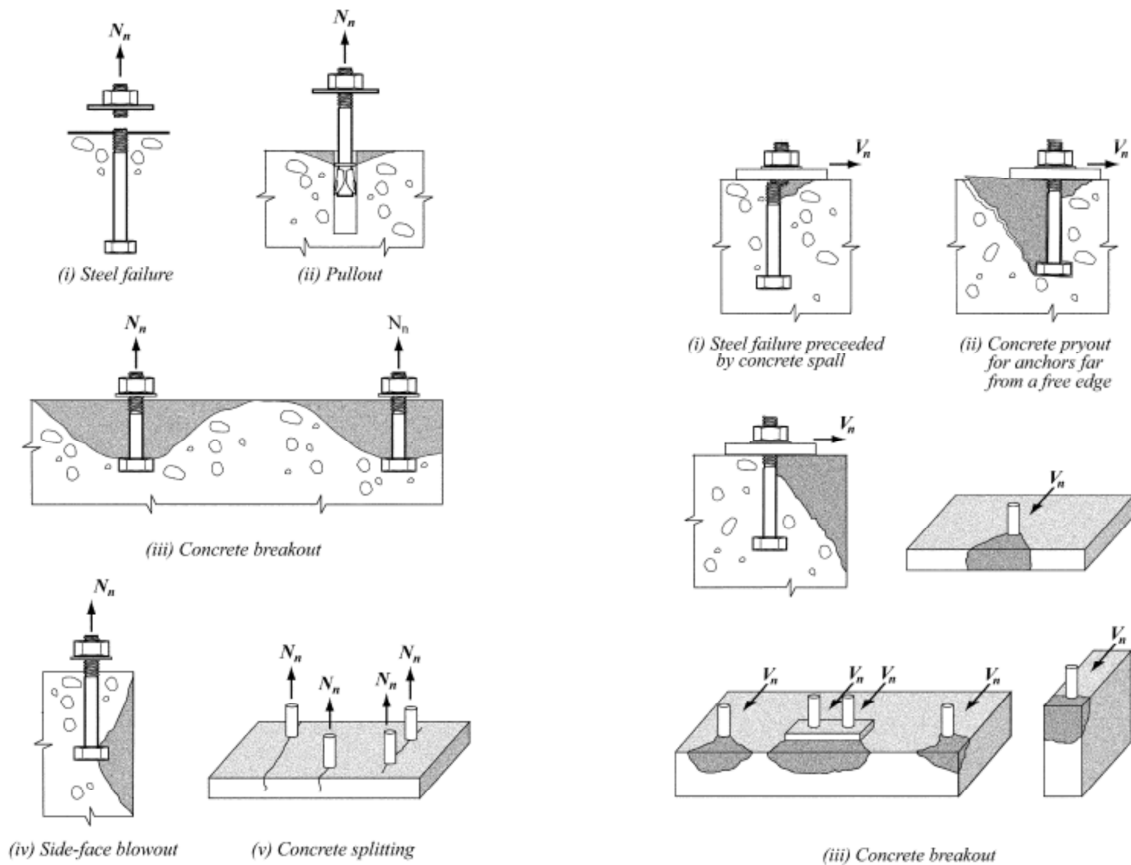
Anchors failure modes in concrete under tension (left) and shear loading (right) (ACI 318 2005)
